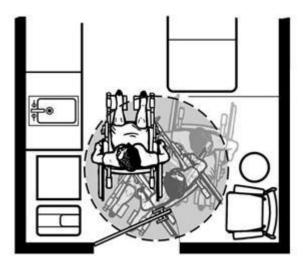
Plan view of part of an examination room showing clear floor space for turning a wheelchair. This space can also make it possible for the lift
